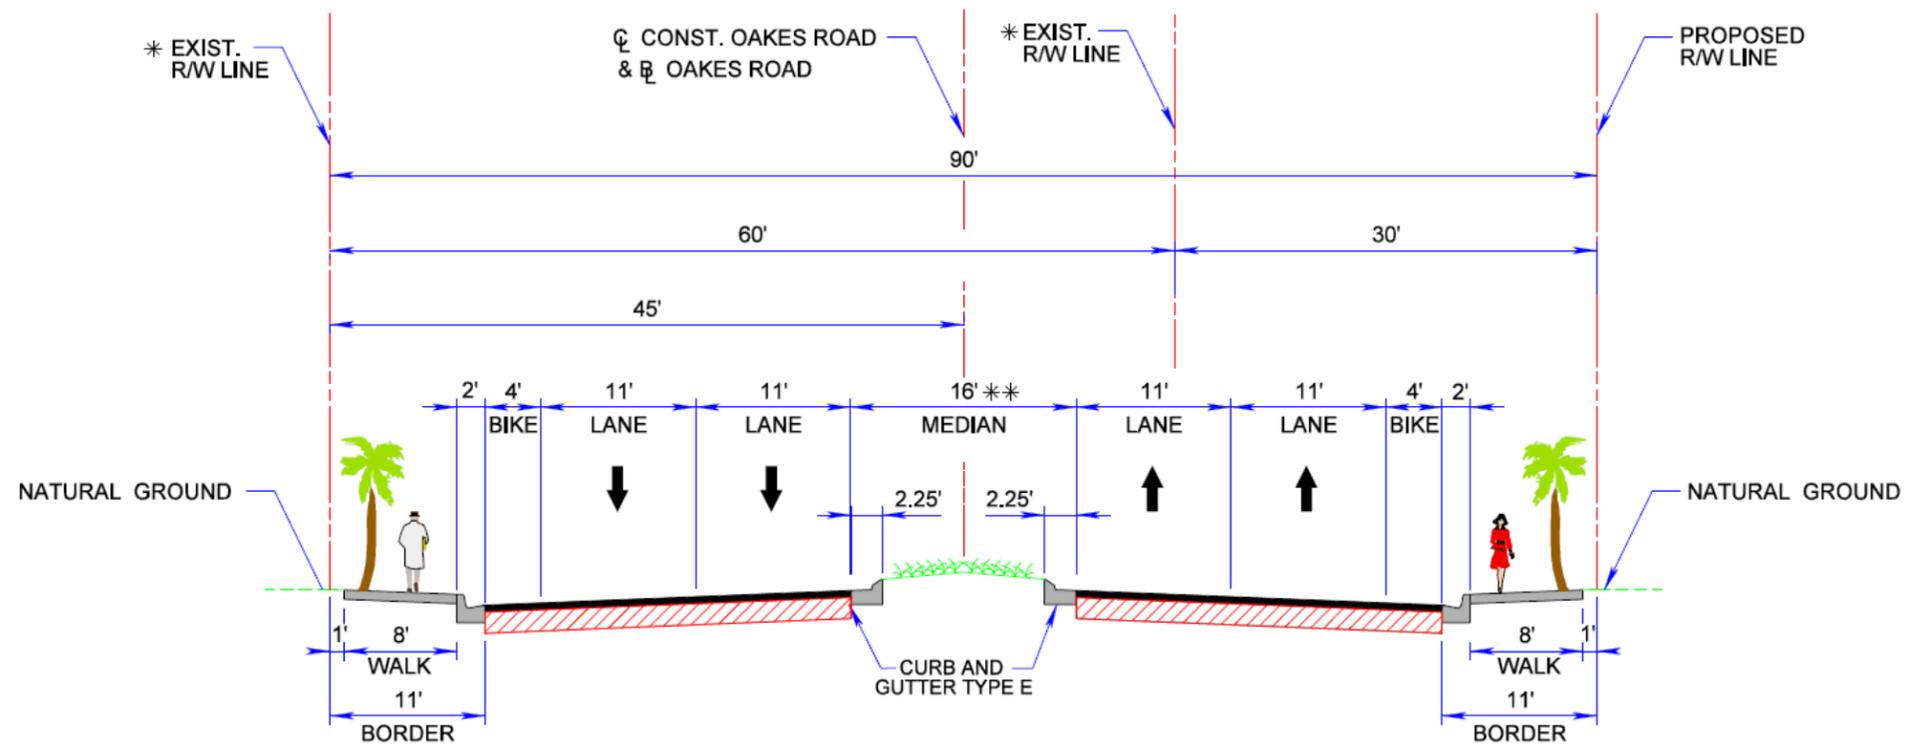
; Oakes Road Typical Section From SR 7 To Burris Road
